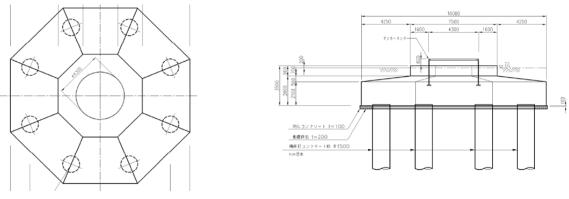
Example 2MW Turbine Foundation Construction (Pile Foundation)
